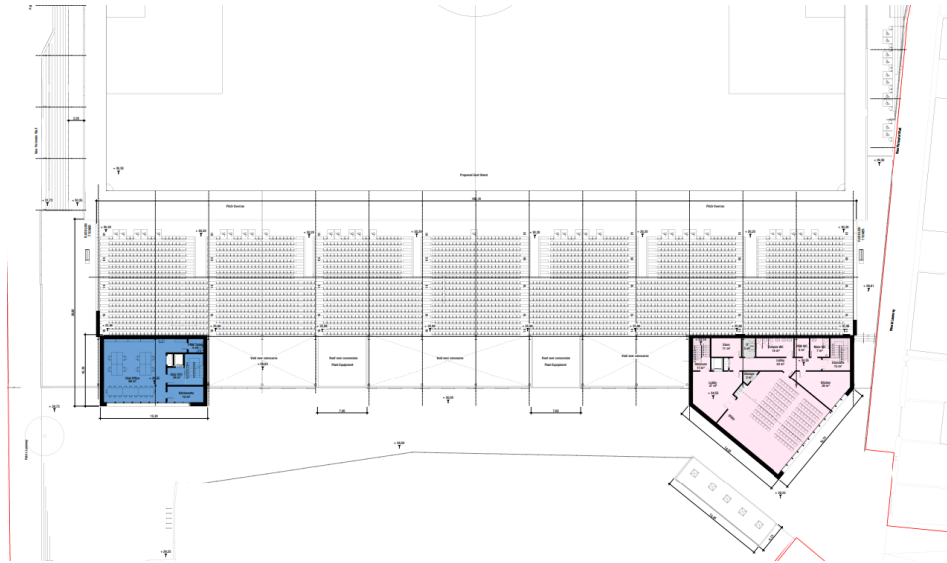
Ground Floor Plan of Proposed Development (Source: IDOM & Gilroy McMahon Architects)
